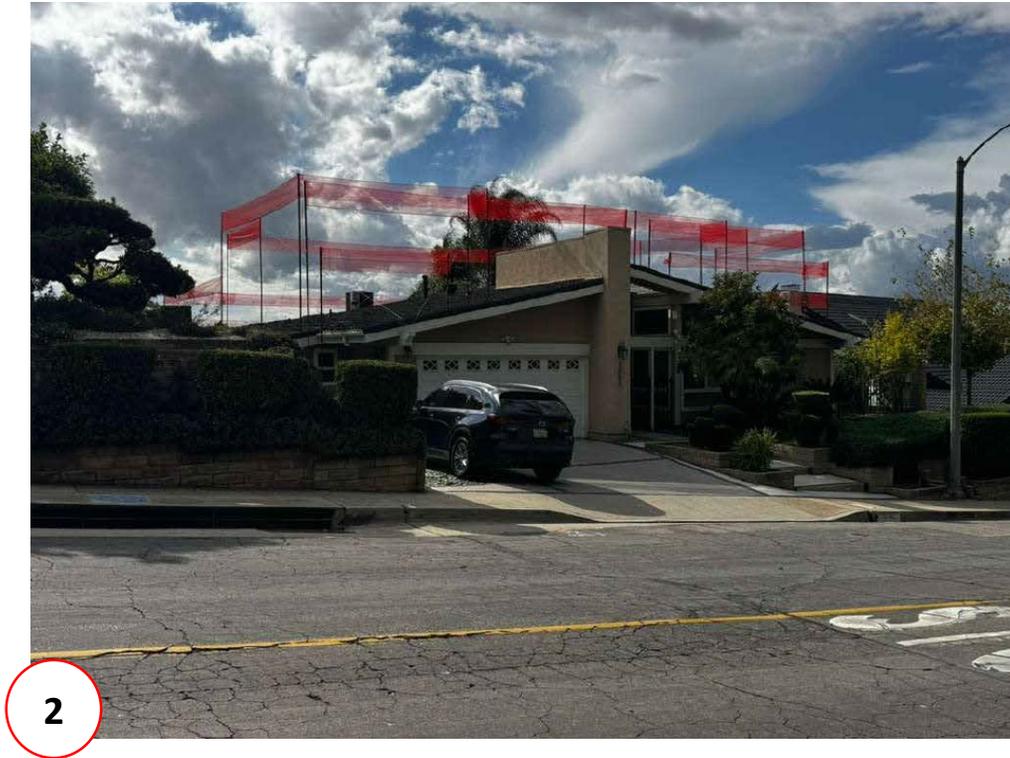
Photo Key – Photos of installed story poles taken from different locations
